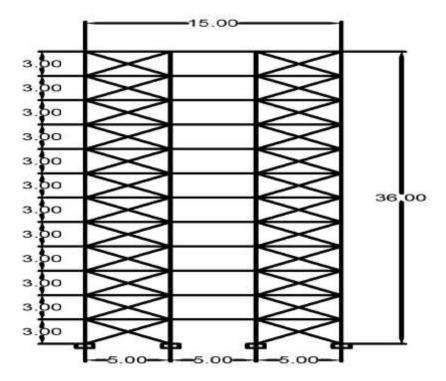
Elevation of 12 storey building with X-bracing in transverse direction Time History Function Details
